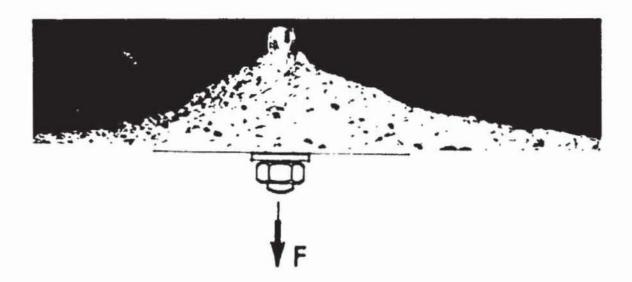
Typical failure cone, type A anchor with anchorage depth  $l_d$  = 125 mm (5 in)
